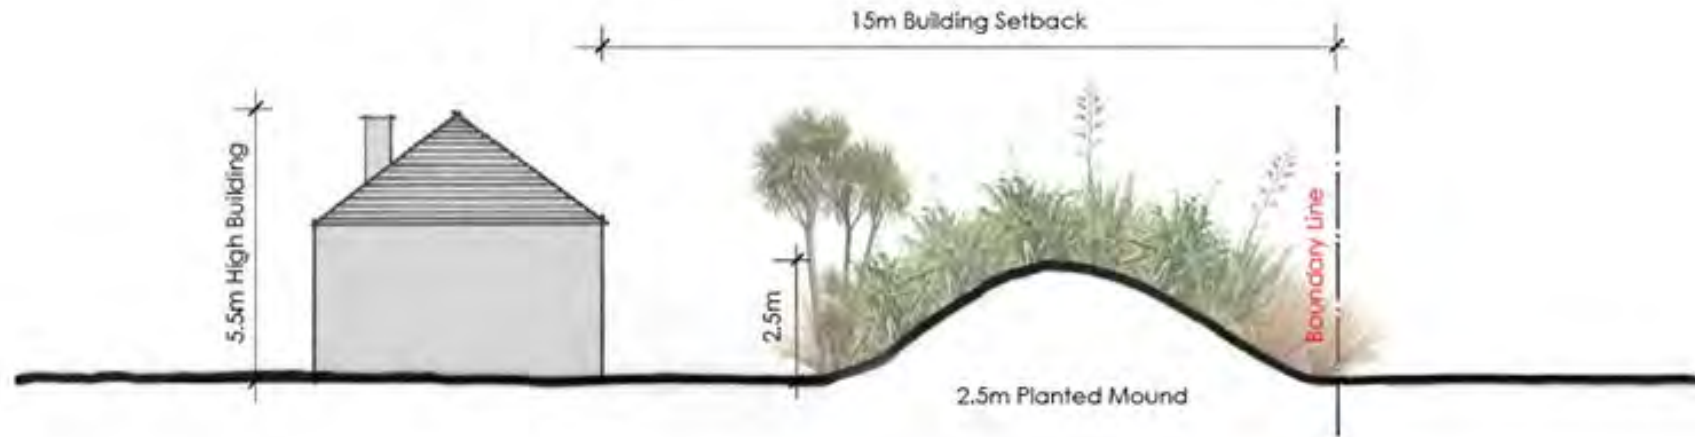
3. Ballantyne Road Low Density Residential Zone Mounding Plan Cross Section
